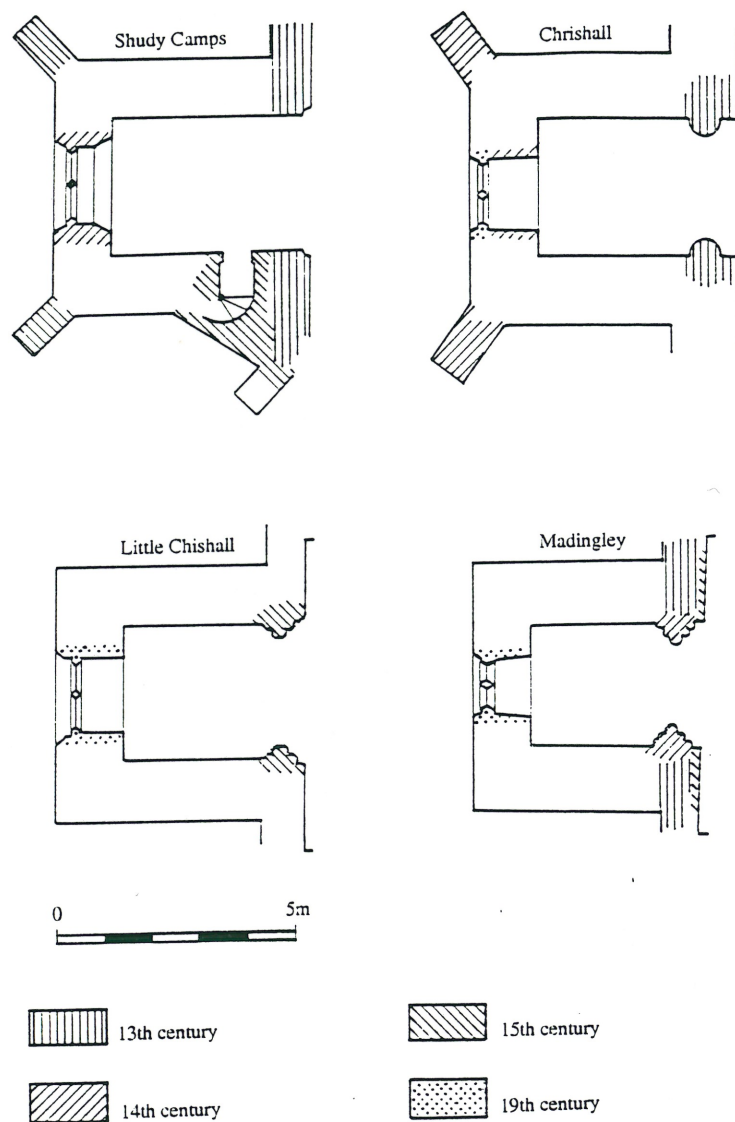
Plan of towers at Shudy Camps, Little Chishall, Madingley in Cambridgeshire, and Chrishall in Essex.
